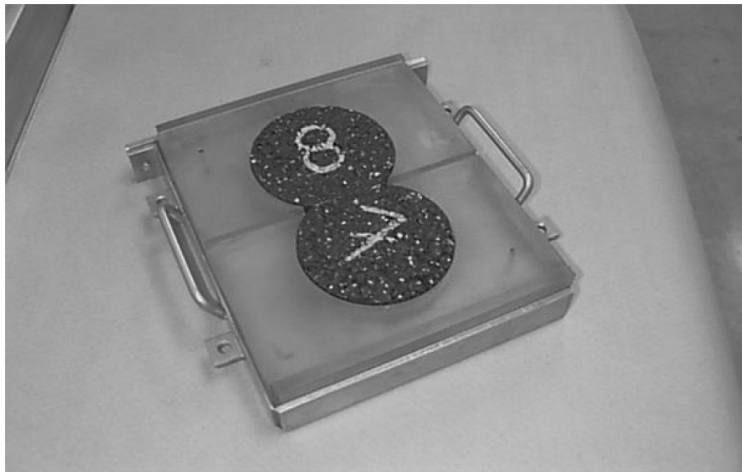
Cylindrical Specimen Mounting System for the Hamburg Wheel Tracking Test (AASHTO T324 2014).
